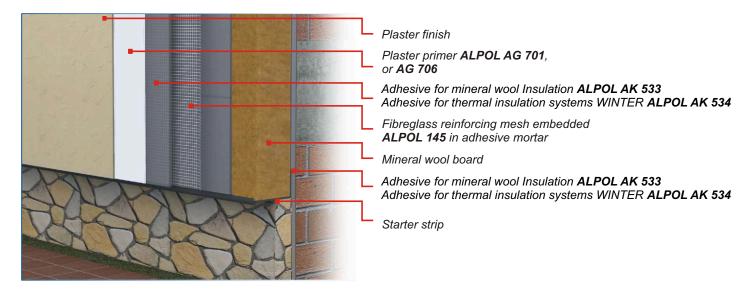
Façade wall insulated with mineral wool with stone finish.
